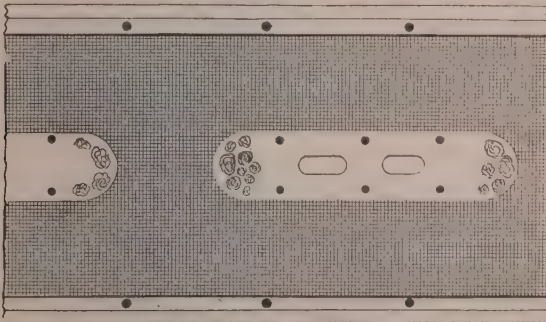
Plan of street with parkway and 6-foot tree belt.
